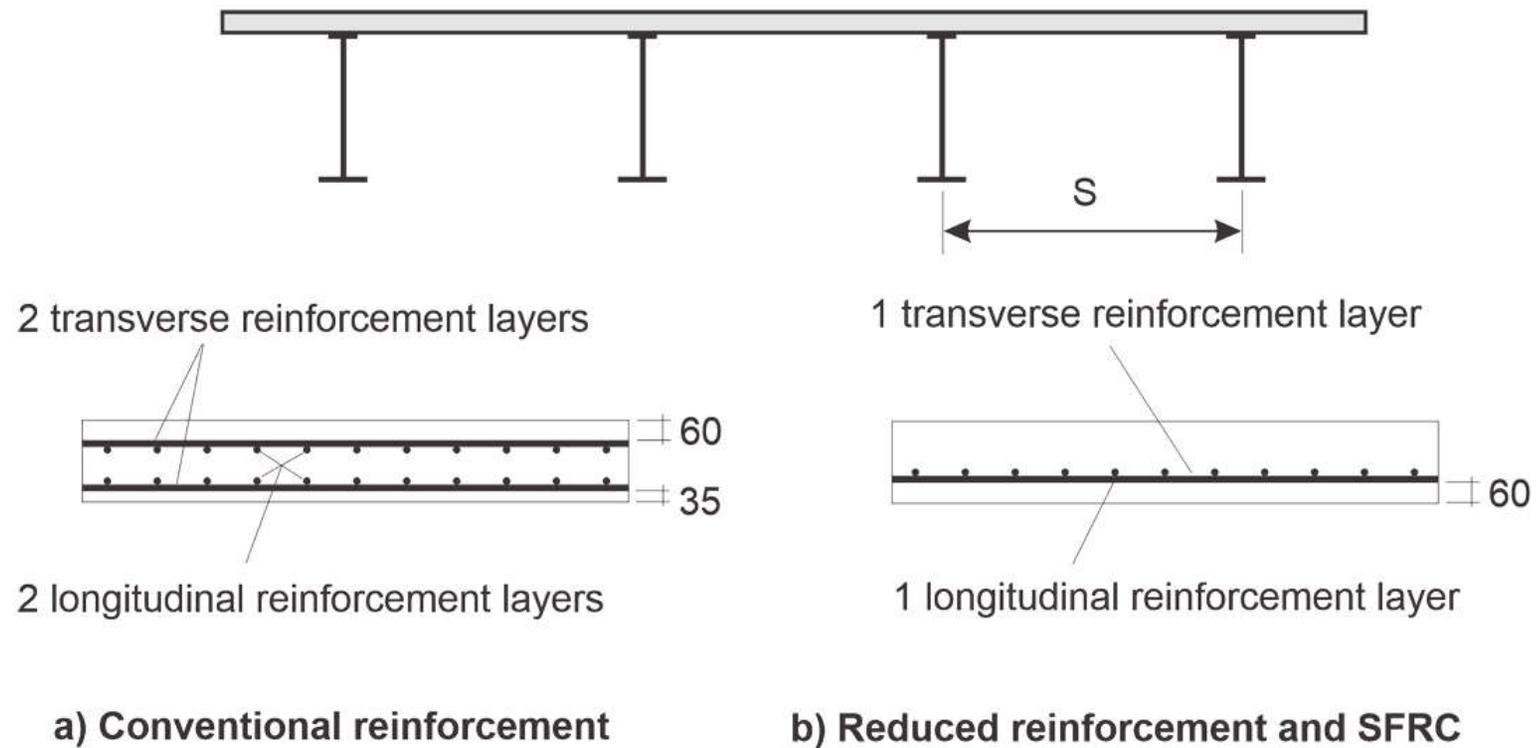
Reinforcement options for typical composite bridge decks.
